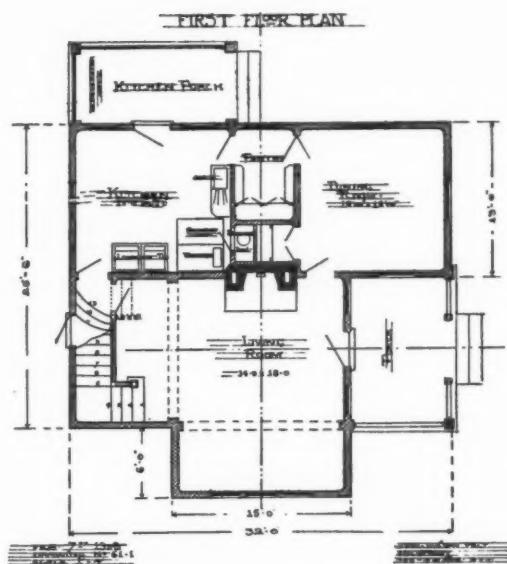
FIRST-FLOOR PLAN OF ECONOMICAL SANITARY HOUSE.
